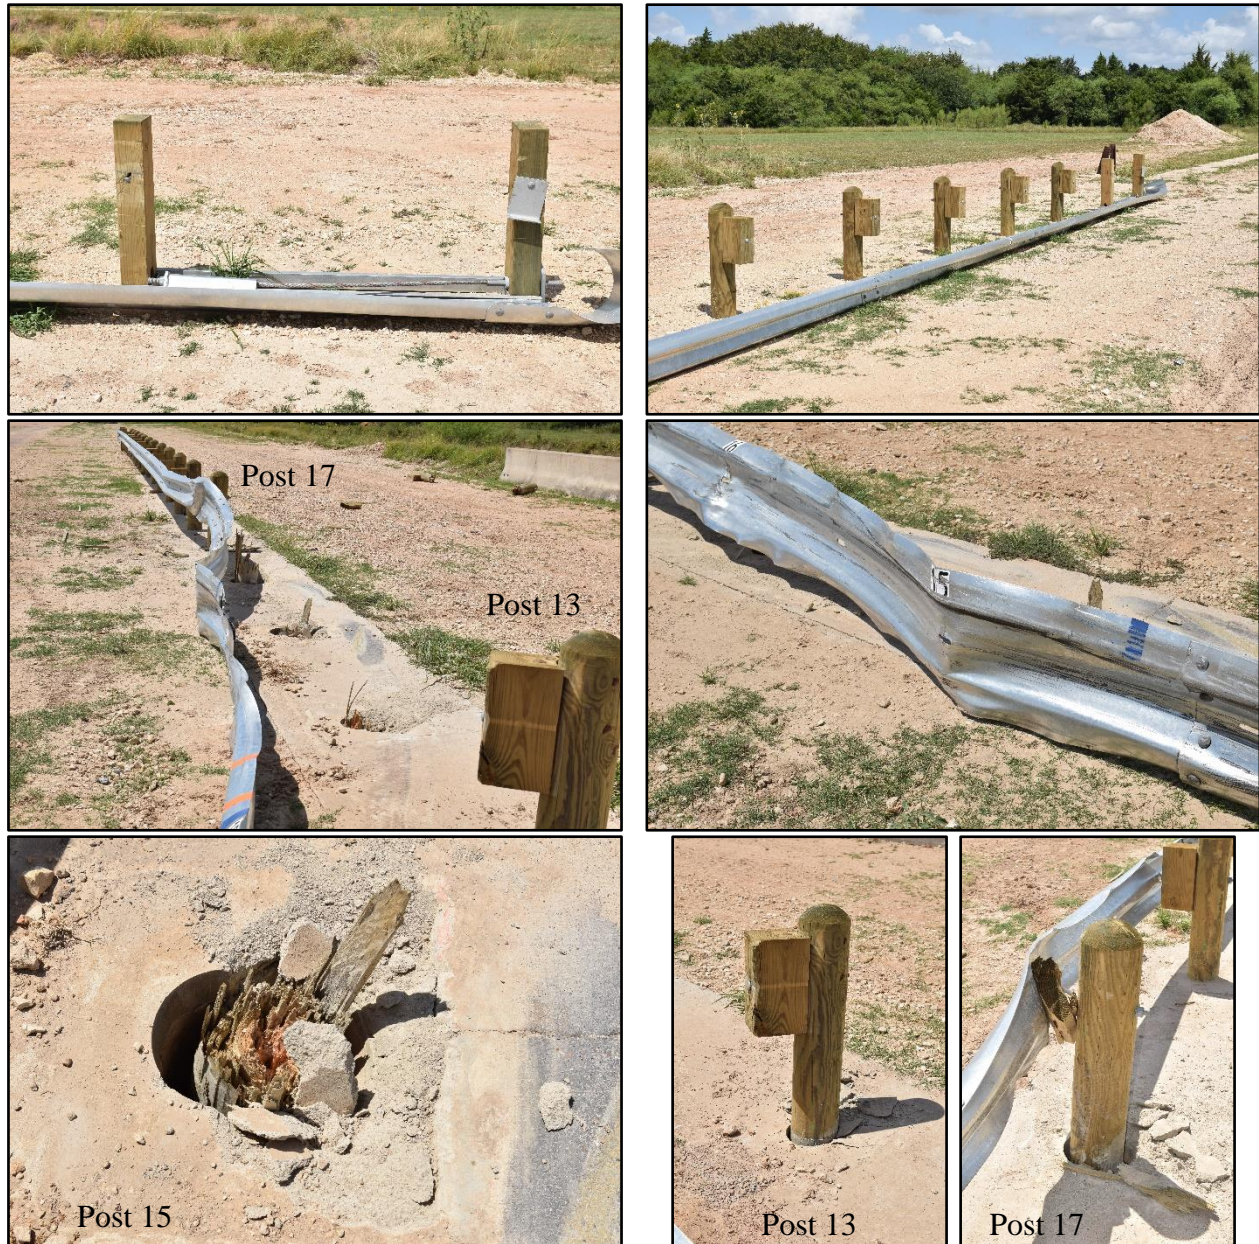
Damage to Installation after Test No. 469689-4-1.
